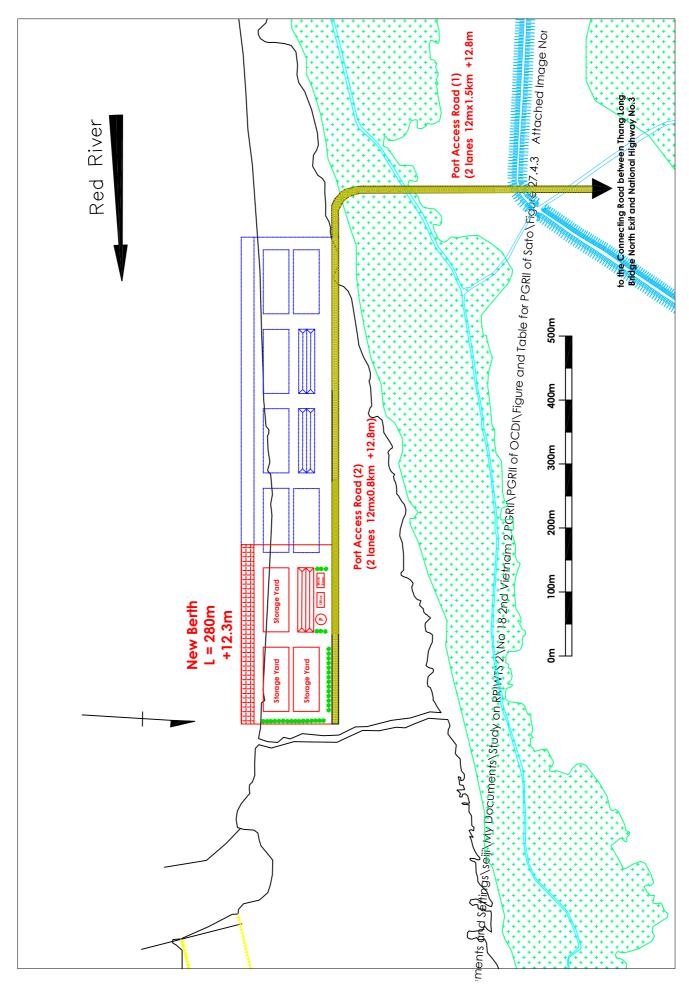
Short-term Development Plan of New North Port (2010)
